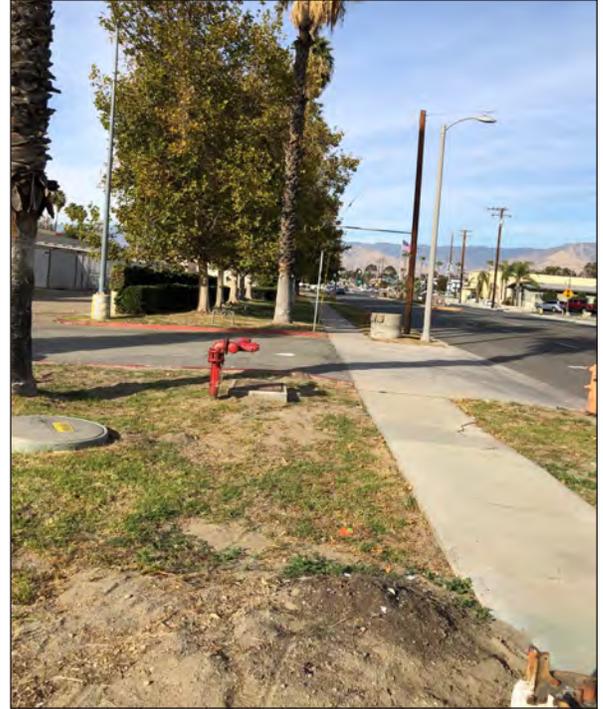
View from the southeast corner looking northwest across the site showing some of the K-mart retail center to the north of the project site and adjacent lot to the west of the project site.
